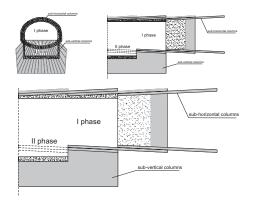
Typical configuration for treatment from within the tunnel (transverse and longitudinal sections).
